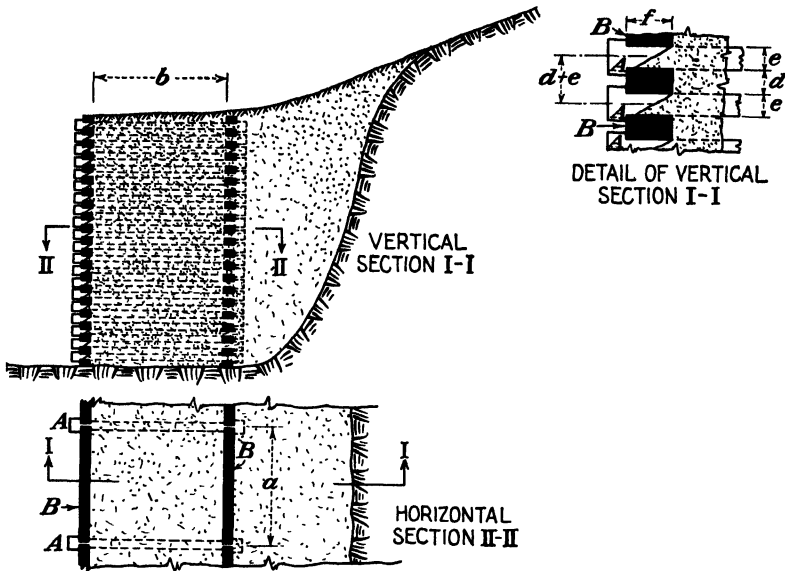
Design of crib retaining wall. Precast reinforced-concrete units (see Fig. 16-5).
